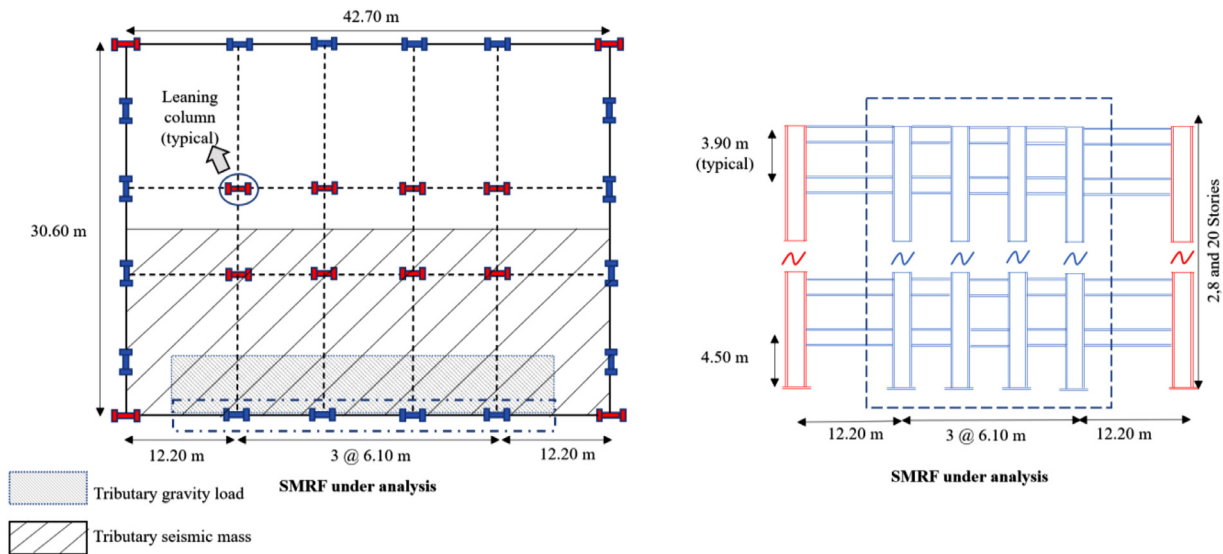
Plan and elevation views for reference building of 2-storey, 8-storey, and 20-storey buildings.
